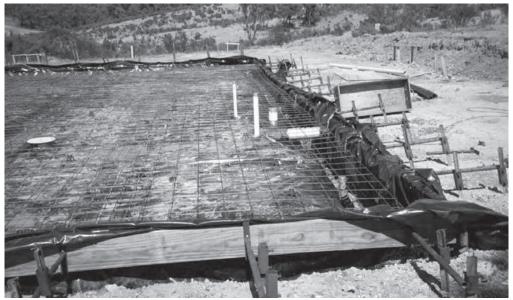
Plastic membrane and steel mesh supported on bar chairs for a concrete slab
